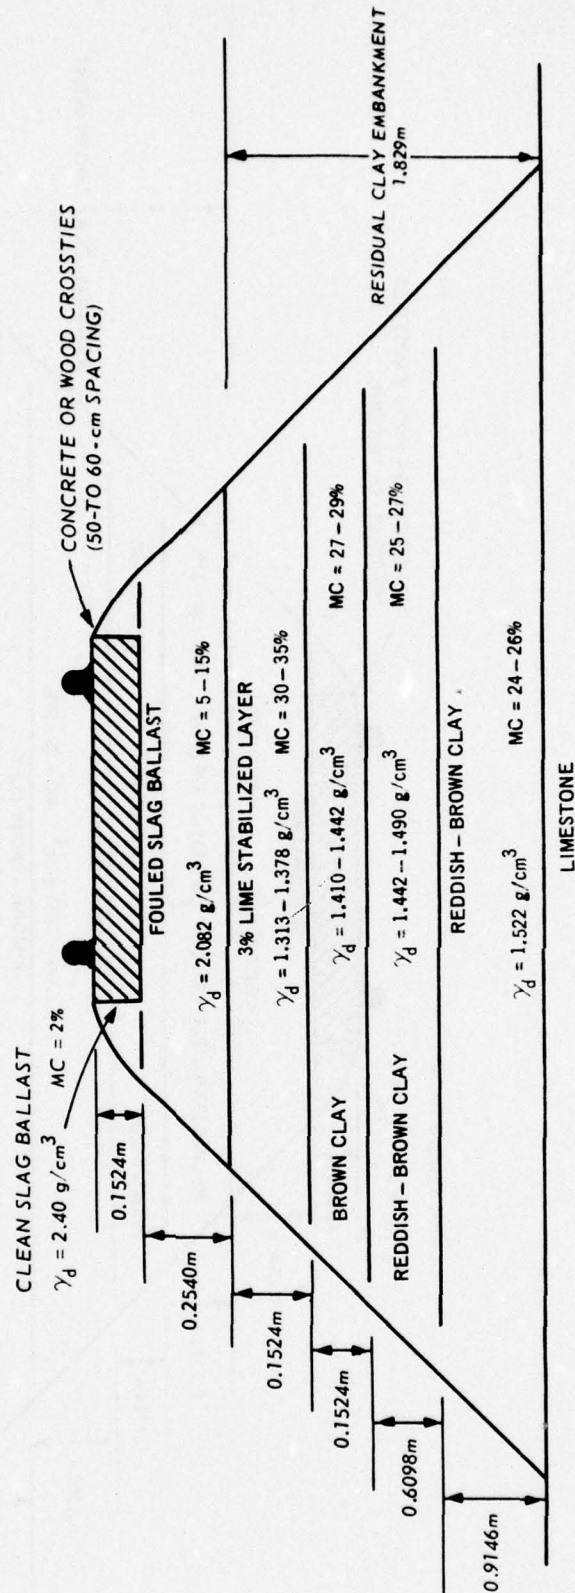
Kansas Test Track-fouled ballast cross section (not to scale)
